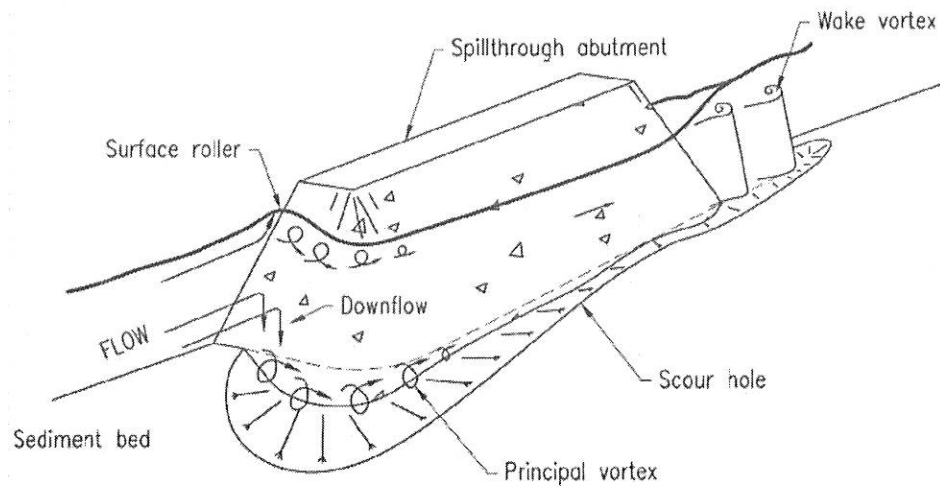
B: Scour at a bridge abutment (HEC-18, 2012)
